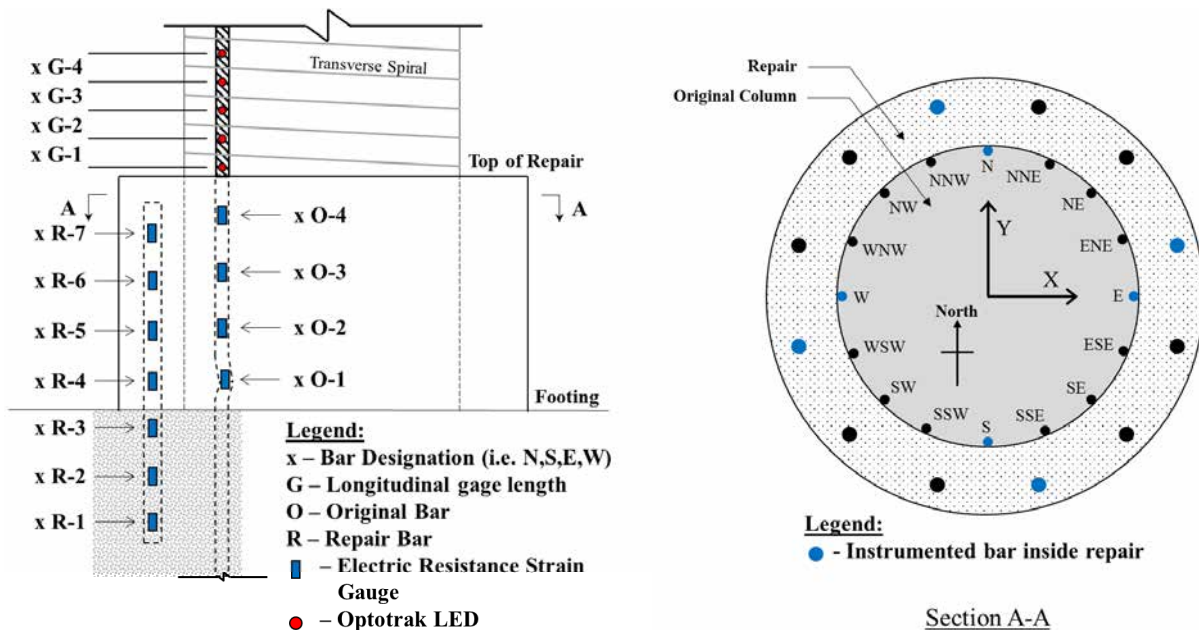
Repair #1 Instrumentation labels and repair cross section layout.
